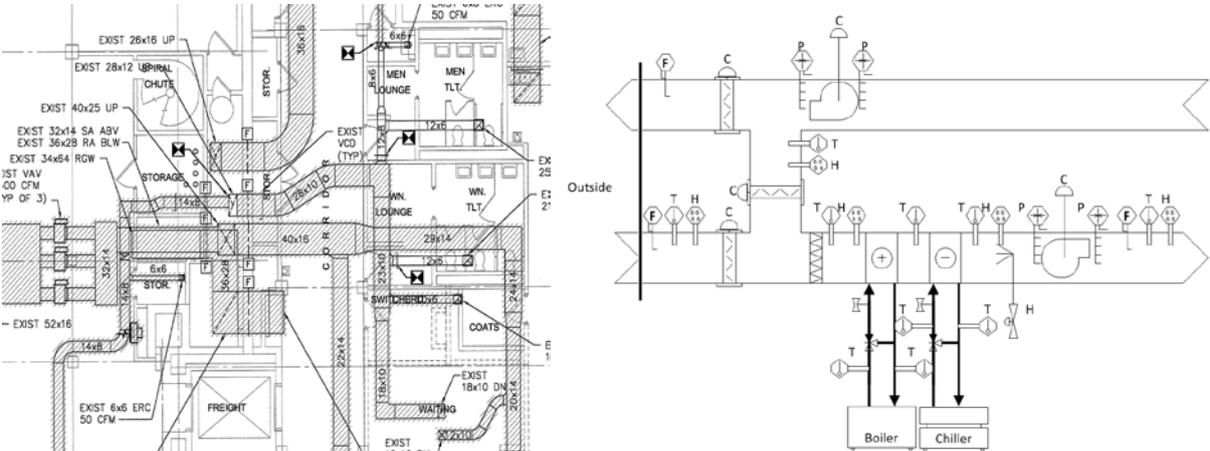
Examples of mechanical plan drawing (left) (a section of mechanical plan of a campus building) and P&ID drawing (right) (adopted from Sugarman (2005))
